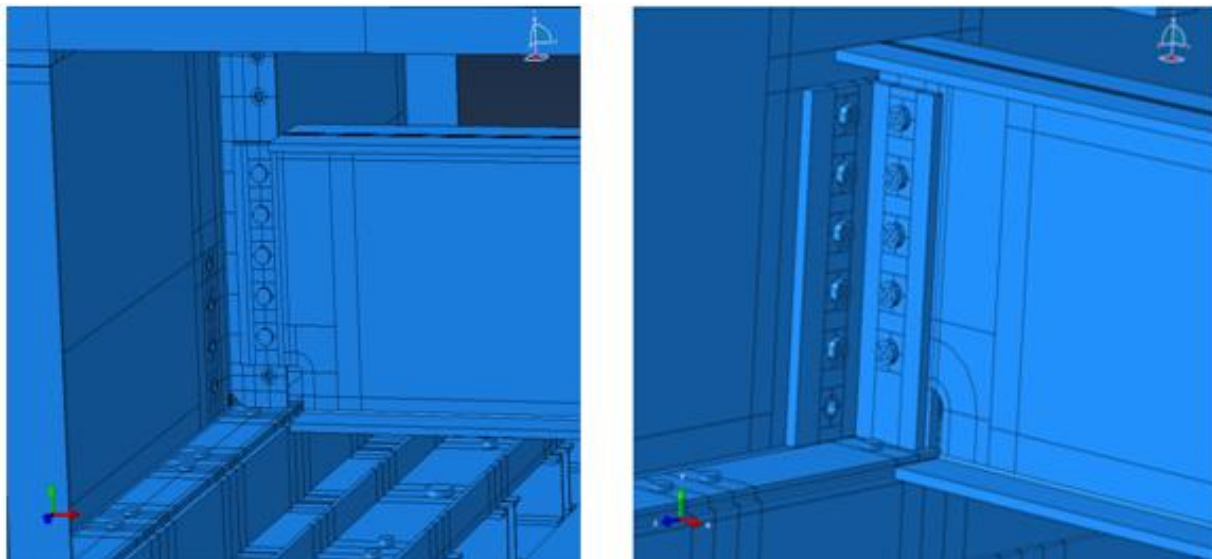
stringer-floorbeam connections: a) Type I b) Type II
